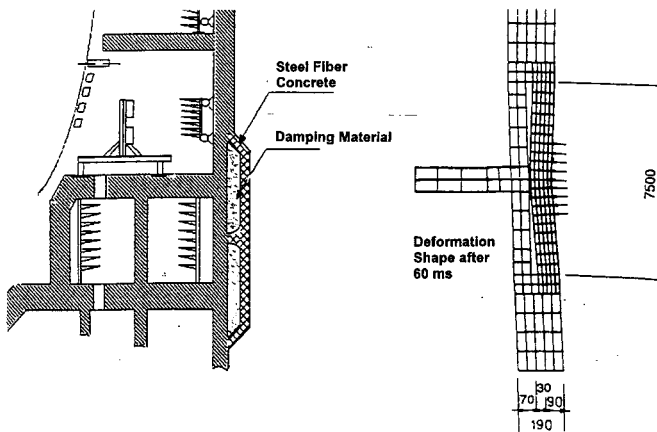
Double Shell Design for Floor Regions to Wall Point
